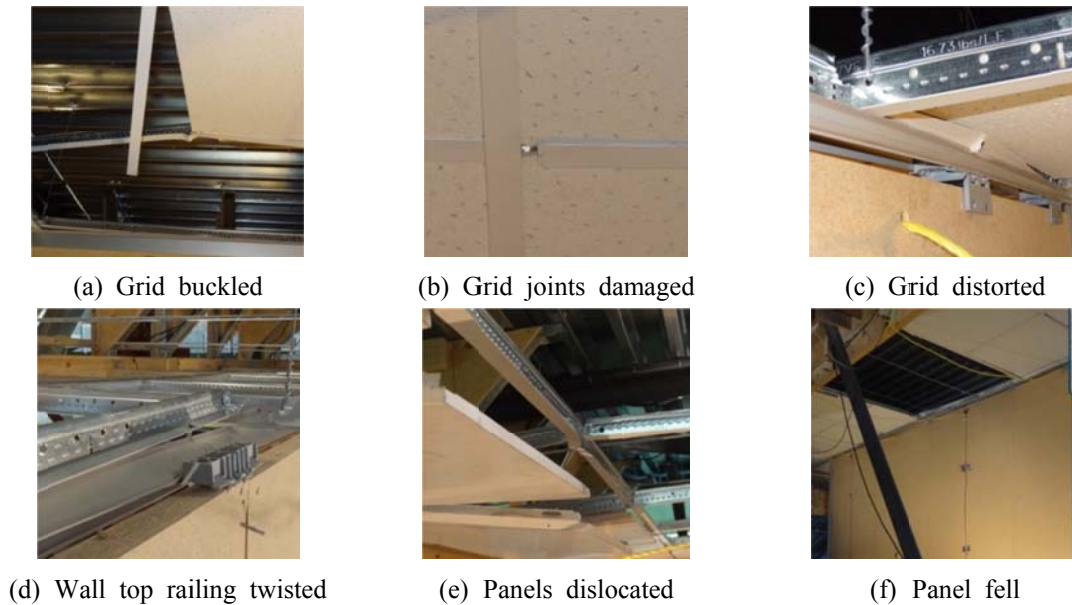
Ceiling damage patterns of the tested CPC specimens
